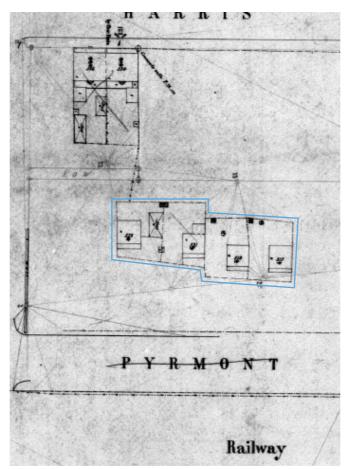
Detail from 1886 plan showing houses at 517–523 Pyrmont Street (Source: Sydney Water PWDS 1544-S206)
